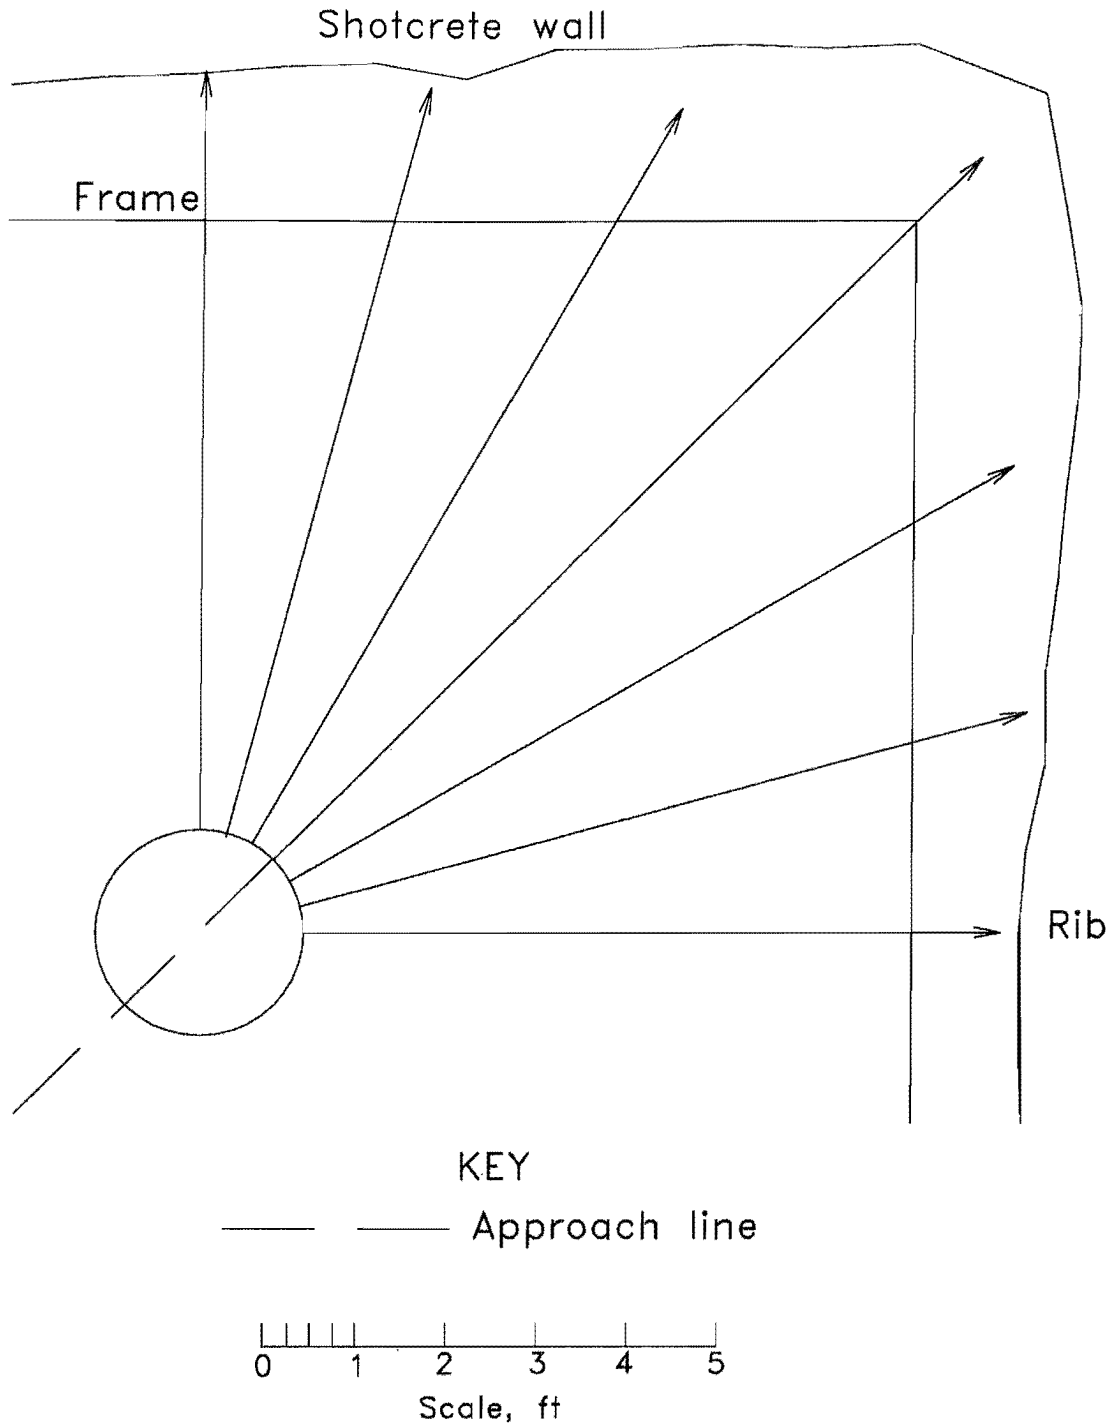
Surveyed concave corner rib and range readings at 10-ft setup.
